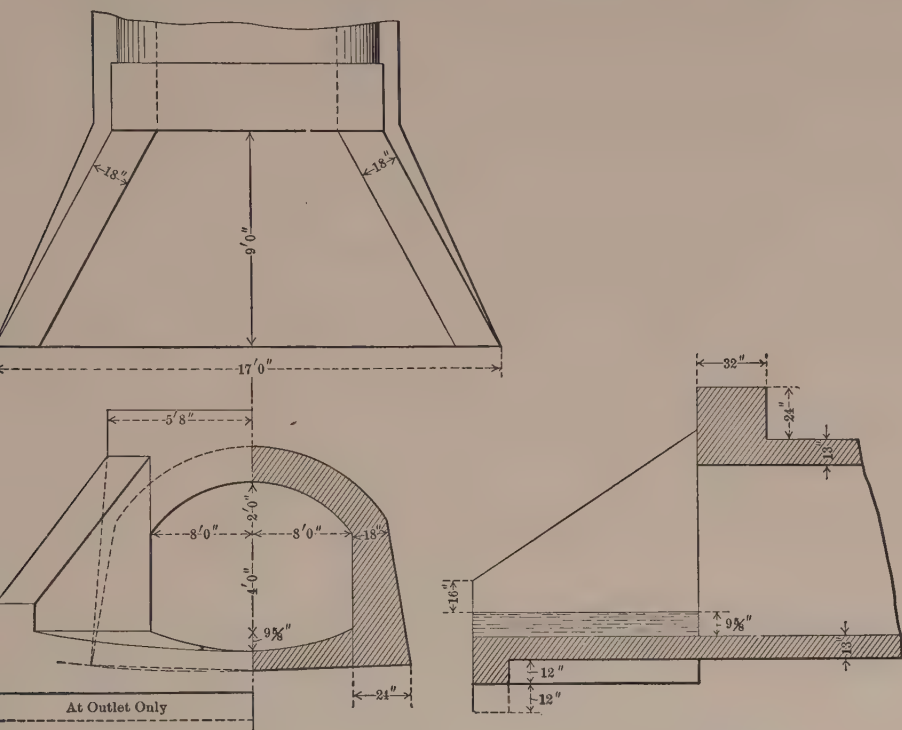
Concrete Arch Culvert. Missouri Pacific Railroad.
